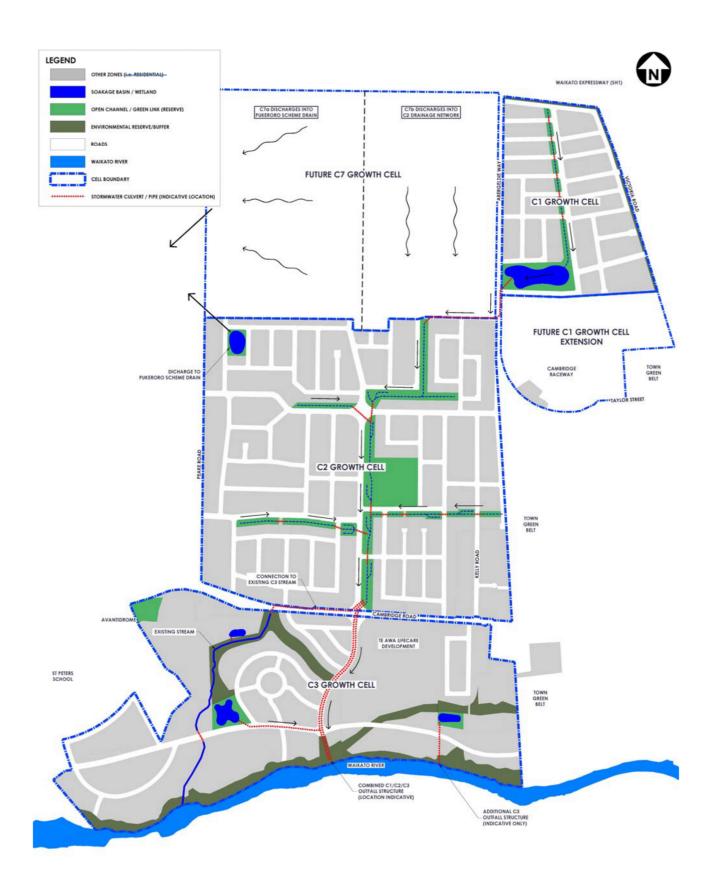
Proposed schematic stormwater layout for the C1 and C2/C3 Growth Cells (also showing future growth cells C7 and C1 Extension) [DR7: 23/2]
